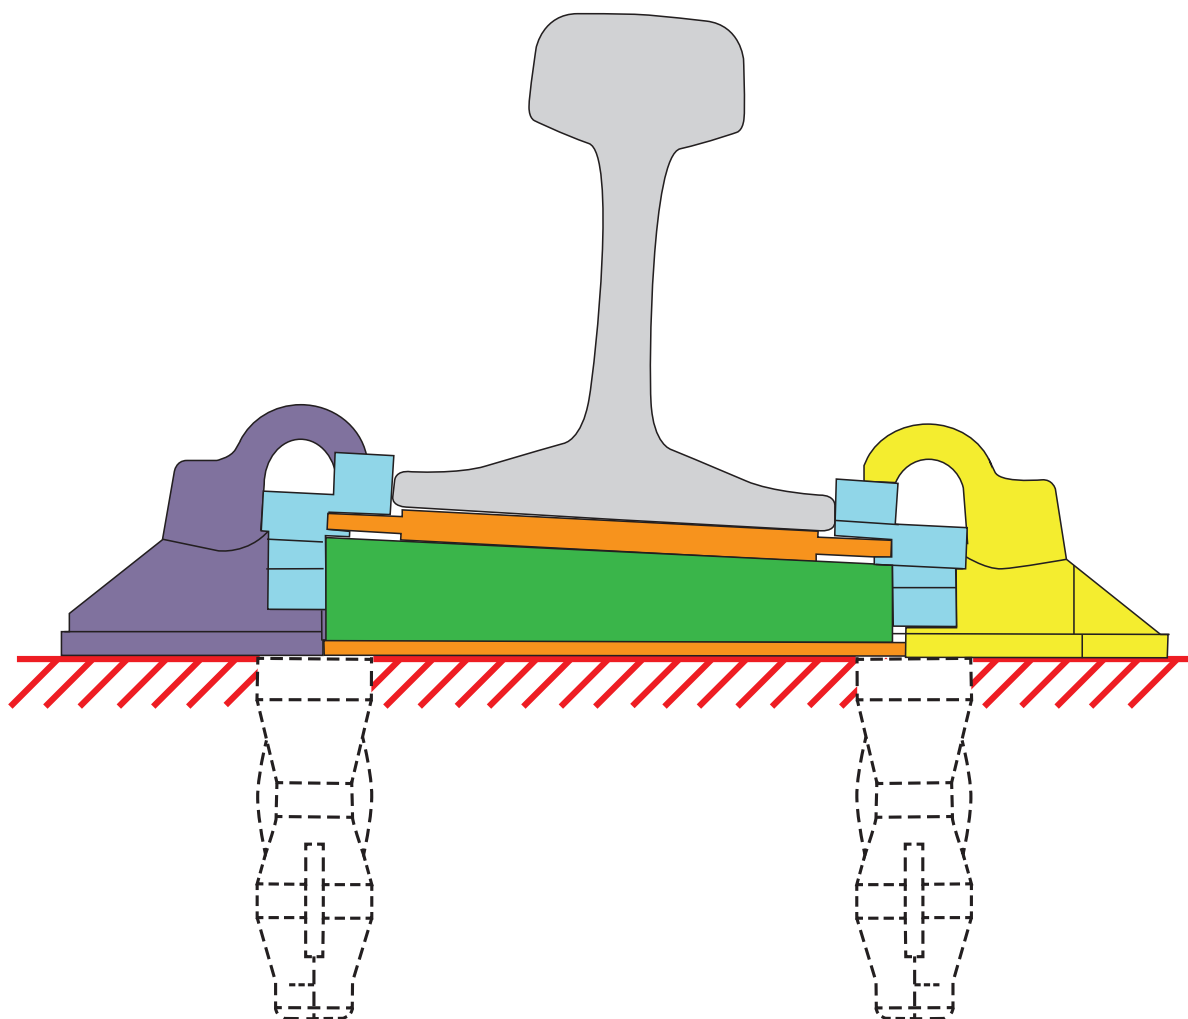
Cross section of a BBRE RT60 layout highlighting the cast iron wedge (green) and elevated shoulder (purple).
